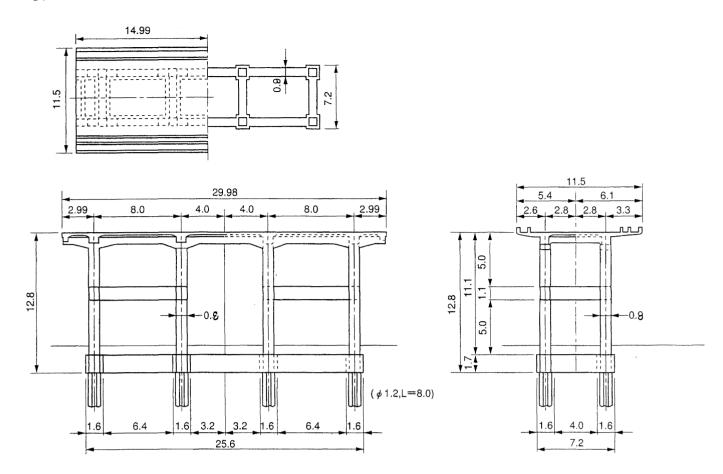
Typical Section of Shinkansen Viaduct
